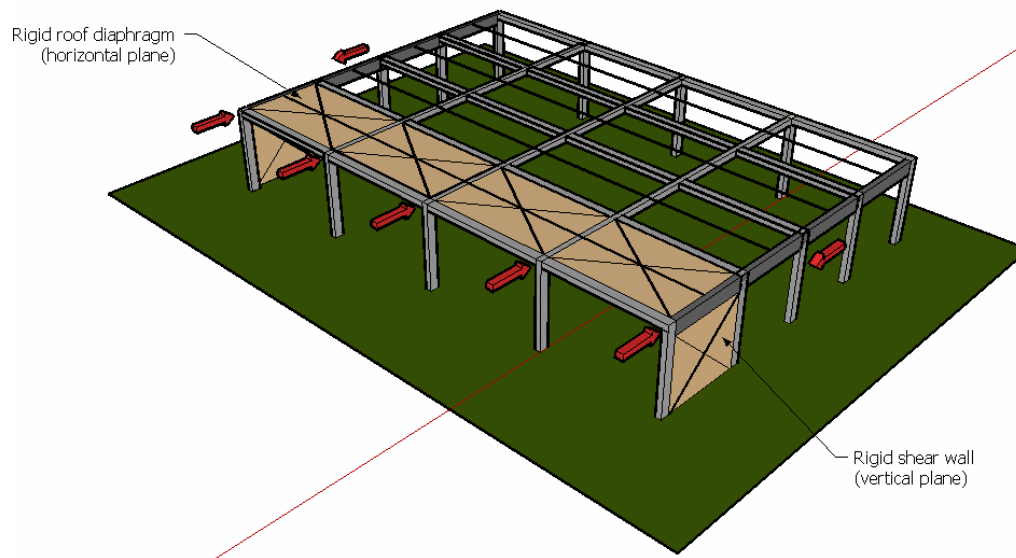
Forces are transferred from the secondary framing on to the rigid shear planes and in turn on to the side shear planes
